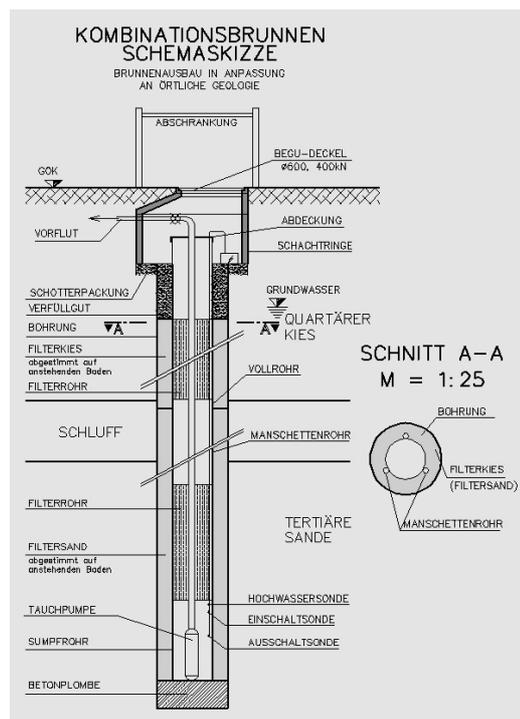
vertical and cross section of a gravity well dewatering to aquifers
